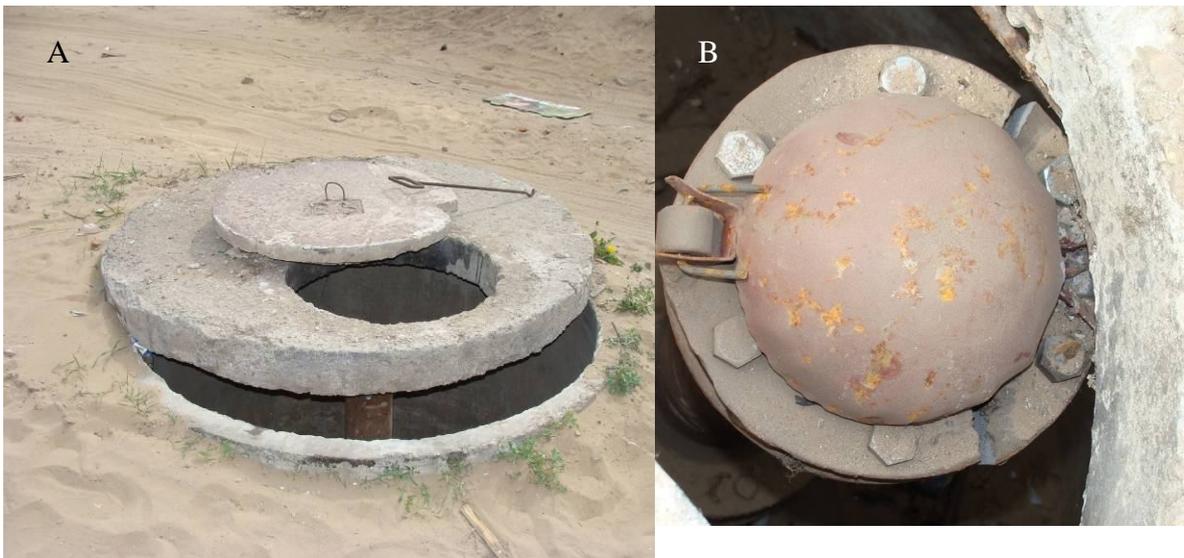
A damaged manhole of hydrant (A) and a broken hydrant (B) (by unknown person) in Riga case study
